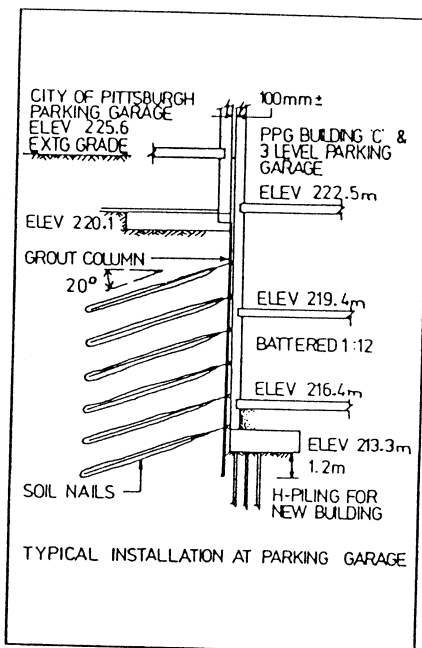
Cross-section at the PPG Building Parking Garage excavation, showing the face pretreated by grouting (Nicholson and Wycliffe-Jones, 1984)
